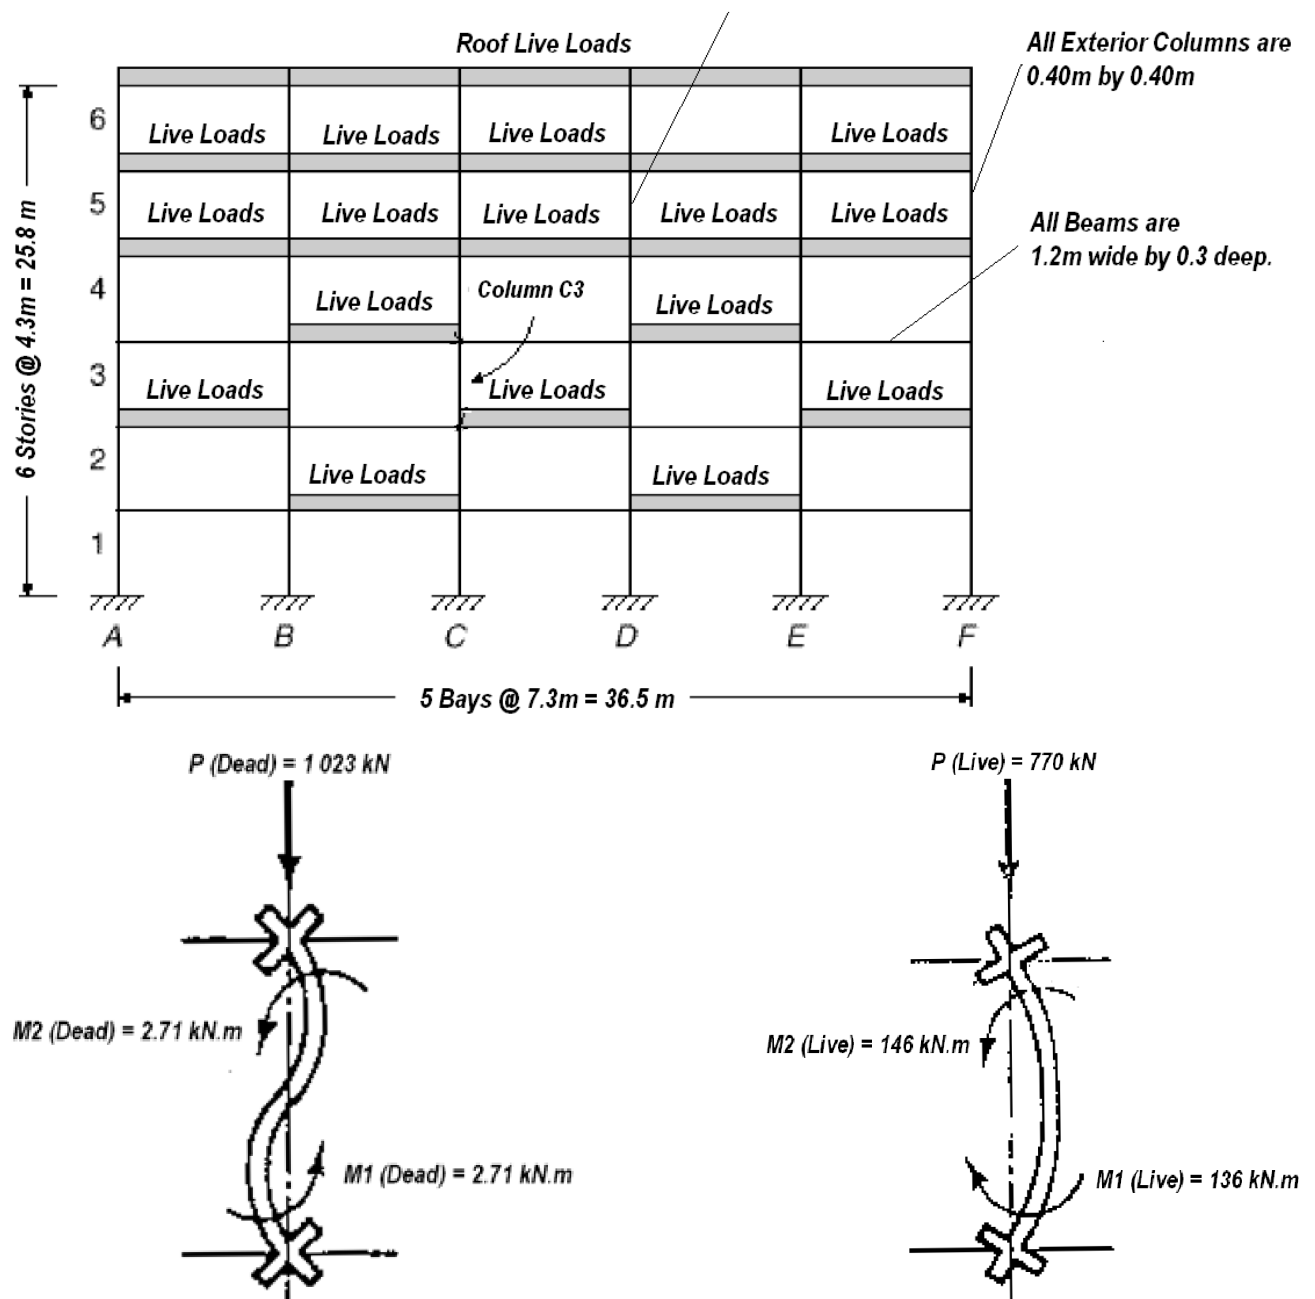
below shows an elevation view of a multistory concrete frame building. Assumptions and Data:
